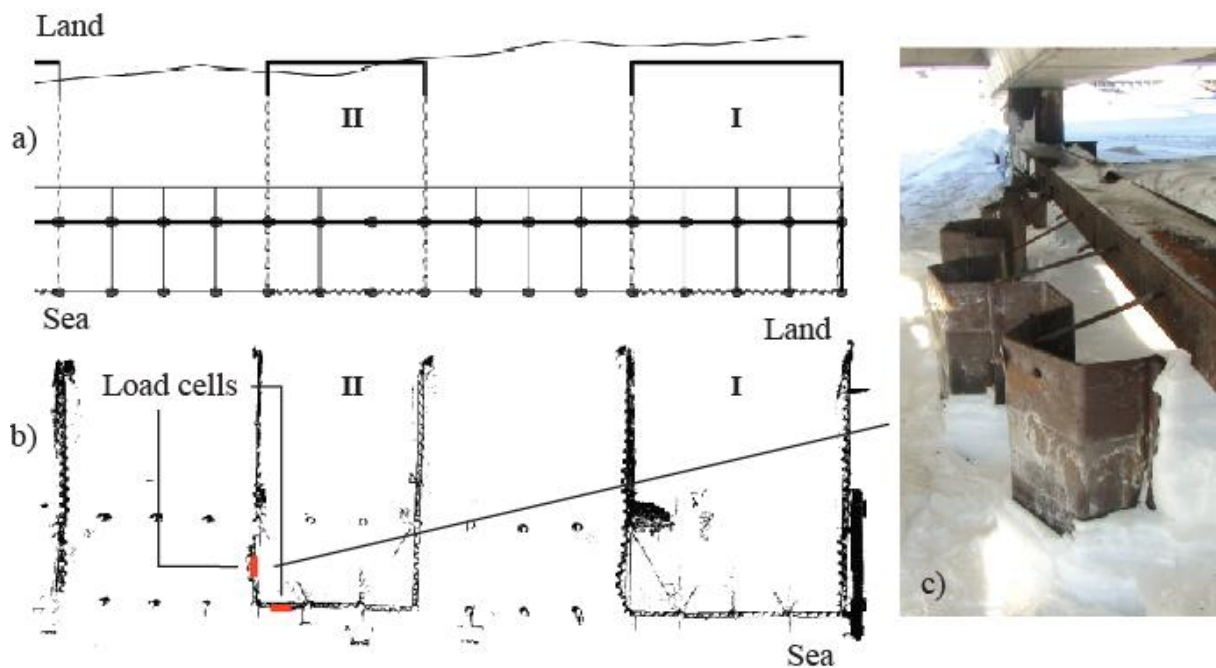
a) Drawing of the sheet piling supporting Kapp Amsterdam. b) Laser scan from 2012 of the sheet piling where deformation can be seen. c) Photo of the deformed sheet piling.
